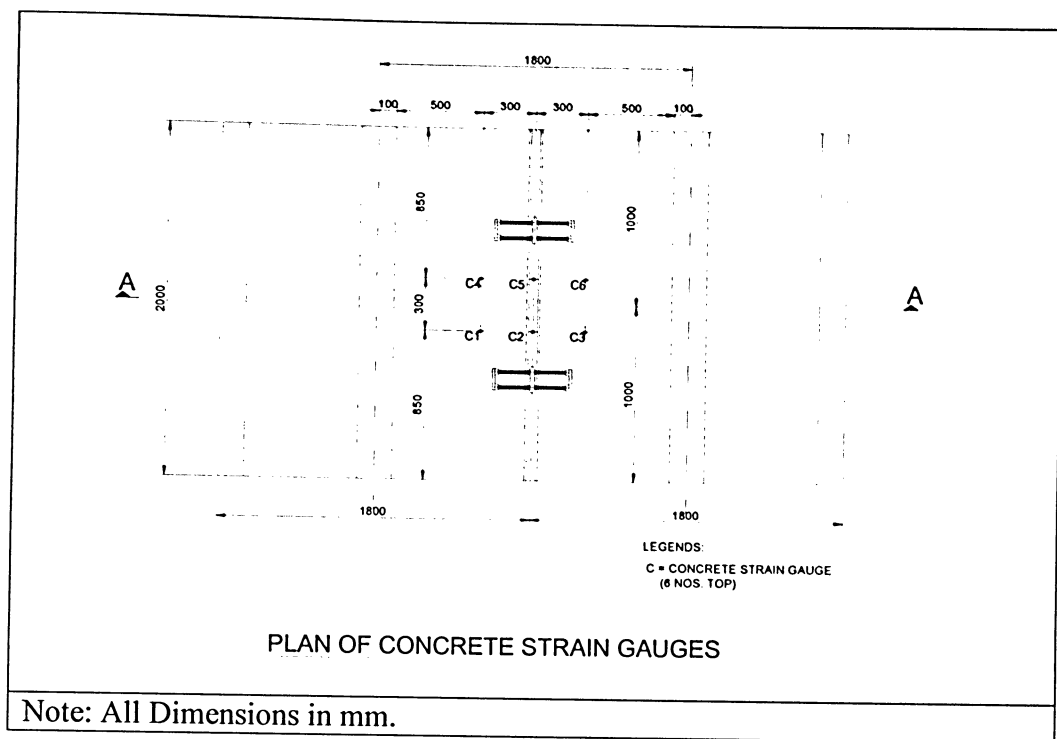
Plan of Concrete Strain Gauges Location For Model M4
